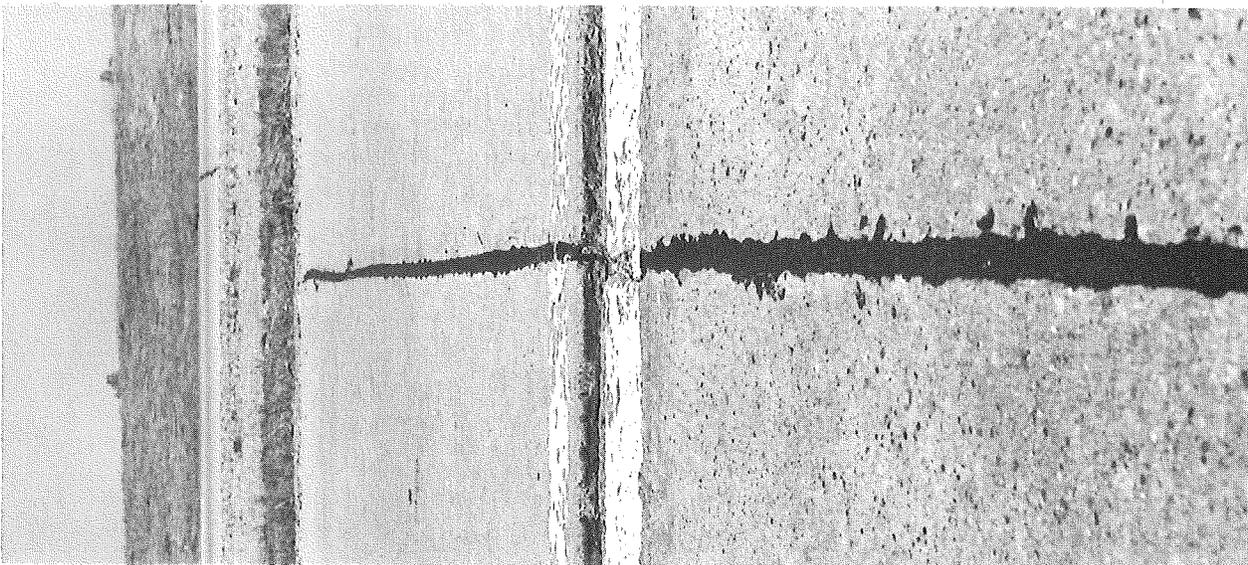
Faulting of longitudinal joint on Belleville Road underpass.
